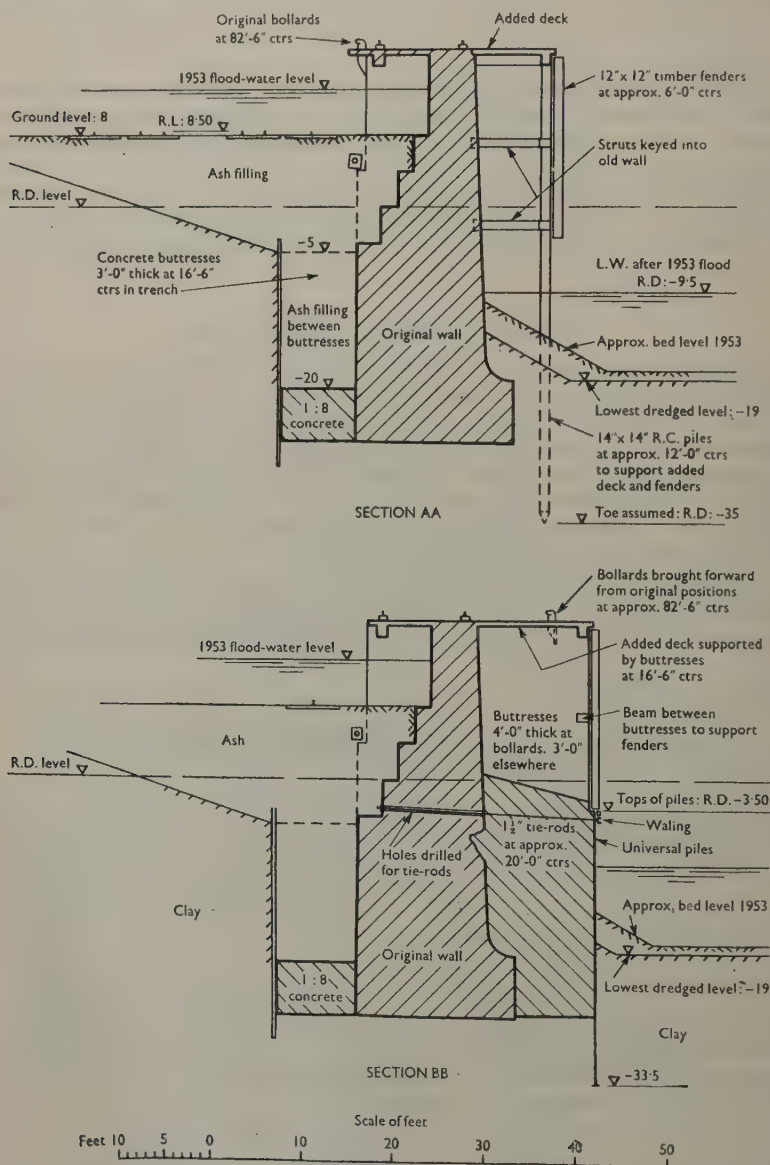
TYPICAL SECTIONS AFTER 1922 REPAIRS (For location, see Fig. 3, Plate 1)
